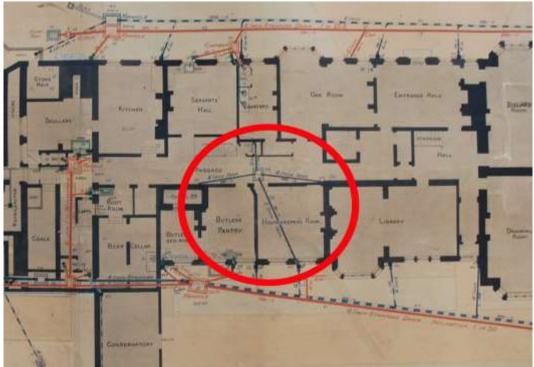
1886 Architects Plan, with the ground-floor drain and pipes circled.
